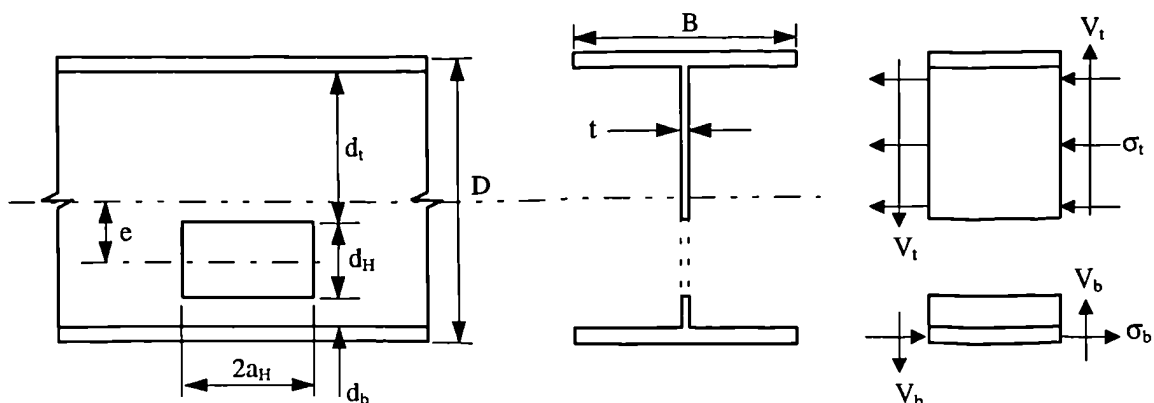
Dimensions of a web hole in a non-composite steel beam
